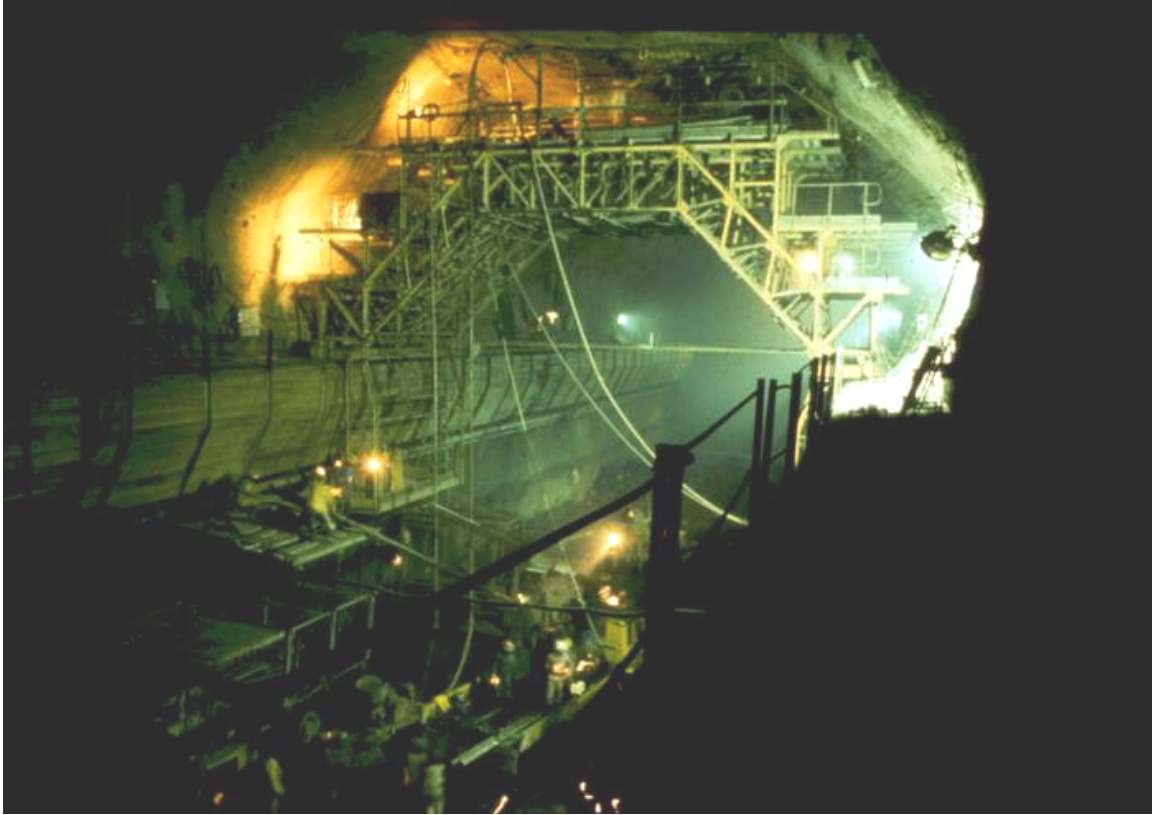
Temporary construction crane running on the main crane beams of the Drakensberg Power Cavern.
